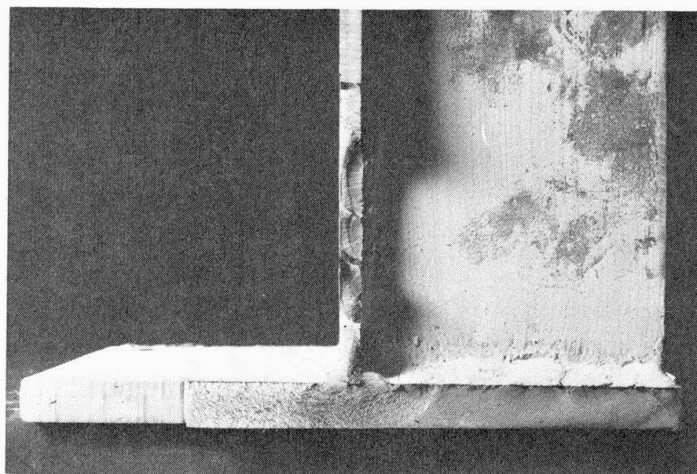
Typical Fatigue Crack Surface at Failure.
